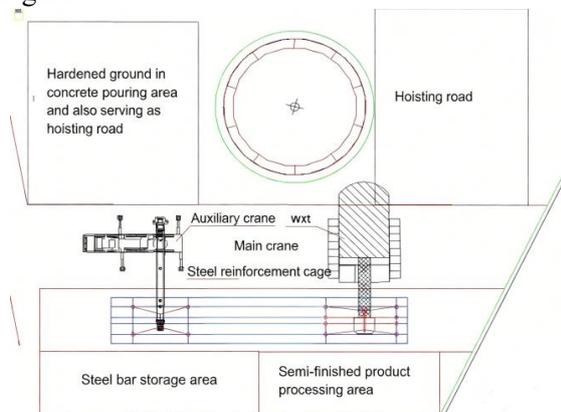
Top View of Diaphragm wall Reinforcement Cage during Horizontal Lifting
